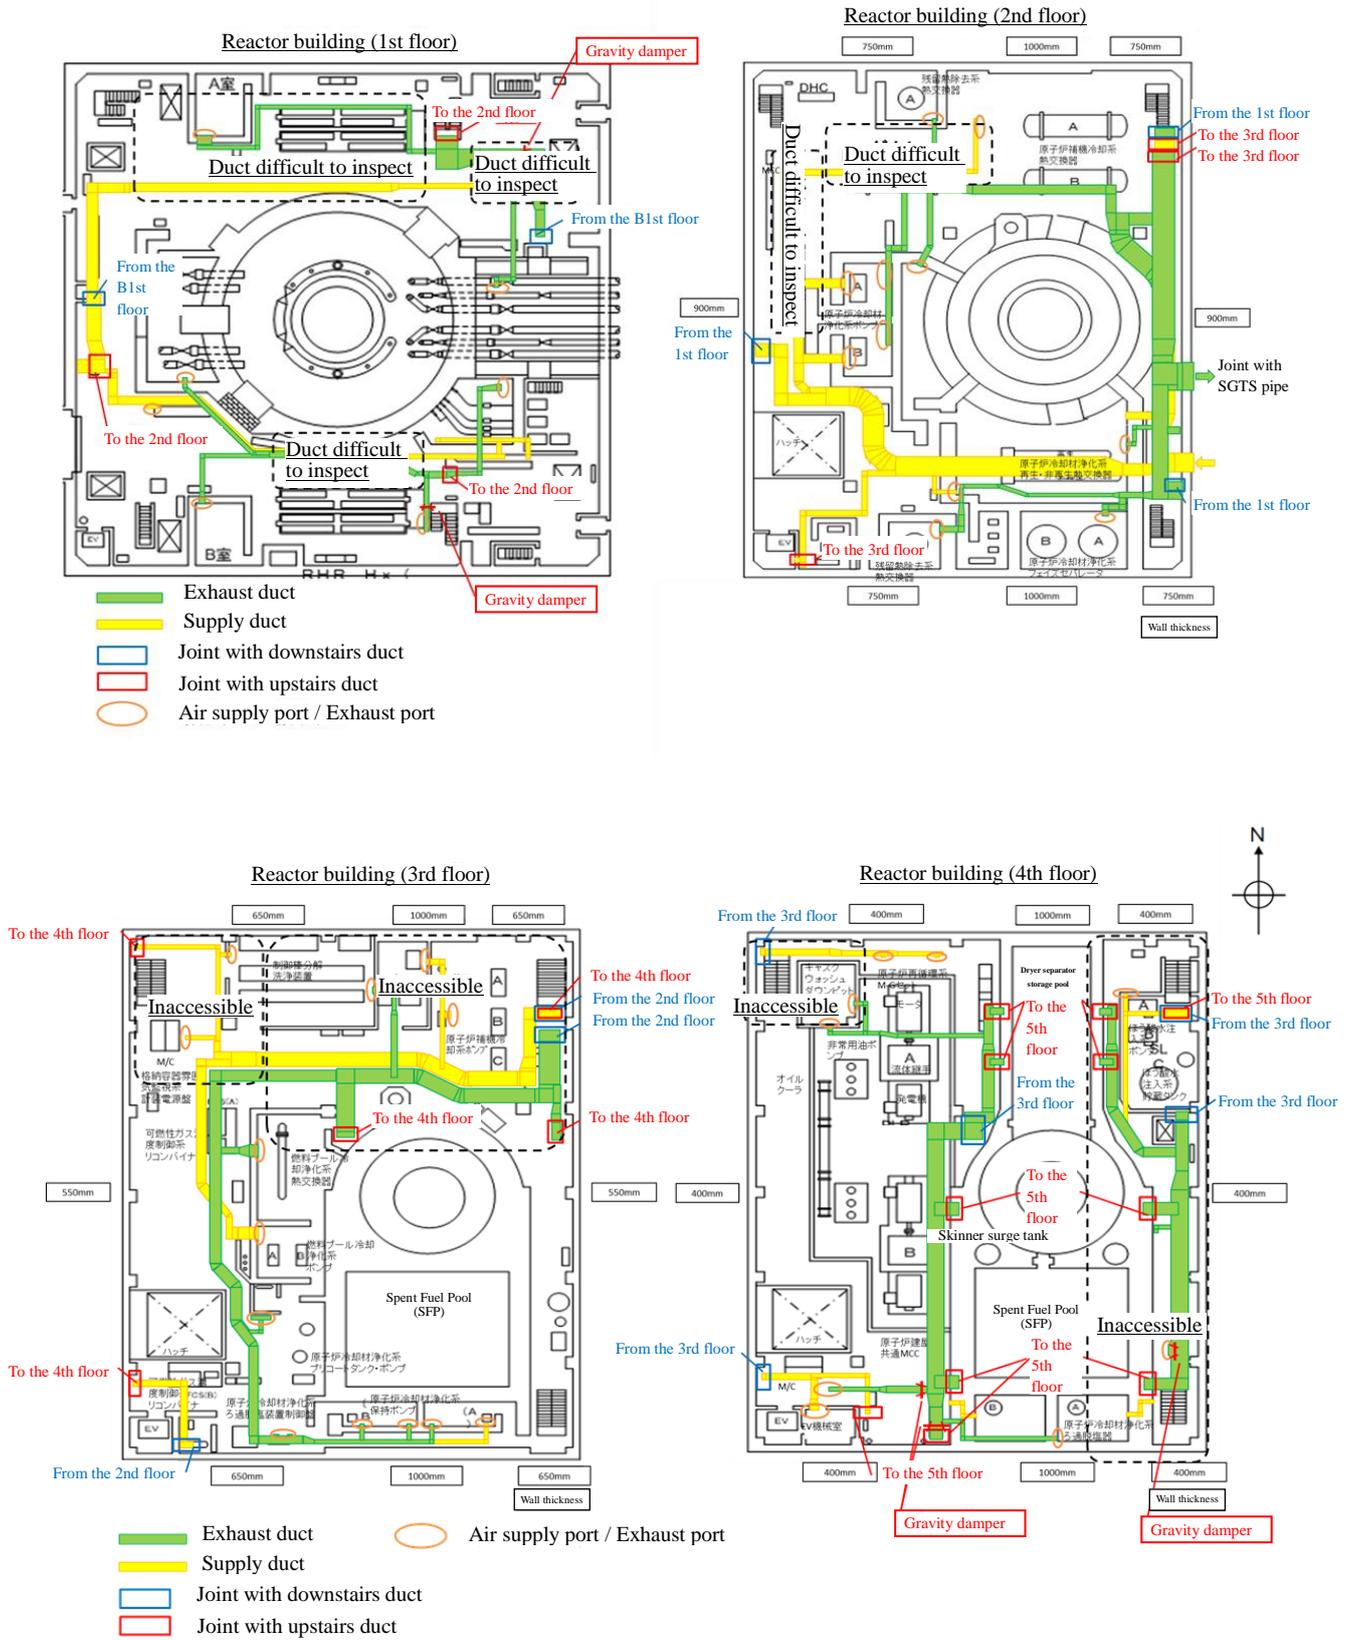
Supply and Exhaust Duct Layout Plan (1st to 4th floors)
